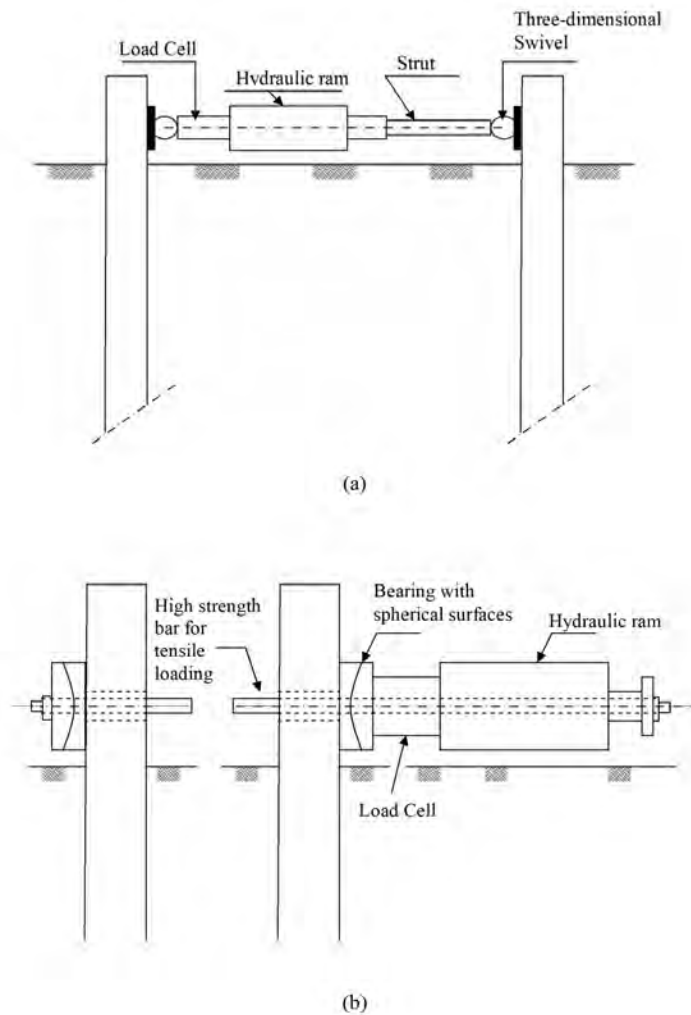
Example of a one-way lateral load test set up on a deep foundation.
